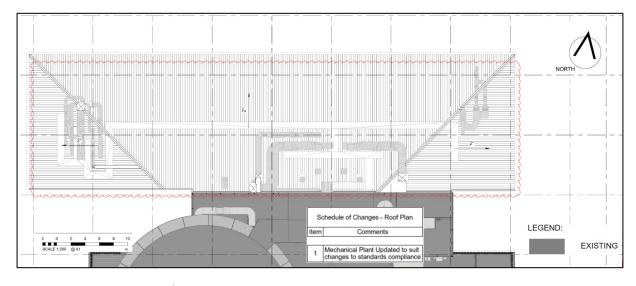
| SSD-8963-Mod-1 Proposed roof plan (Base source: SSD-8963-Mod-1)
